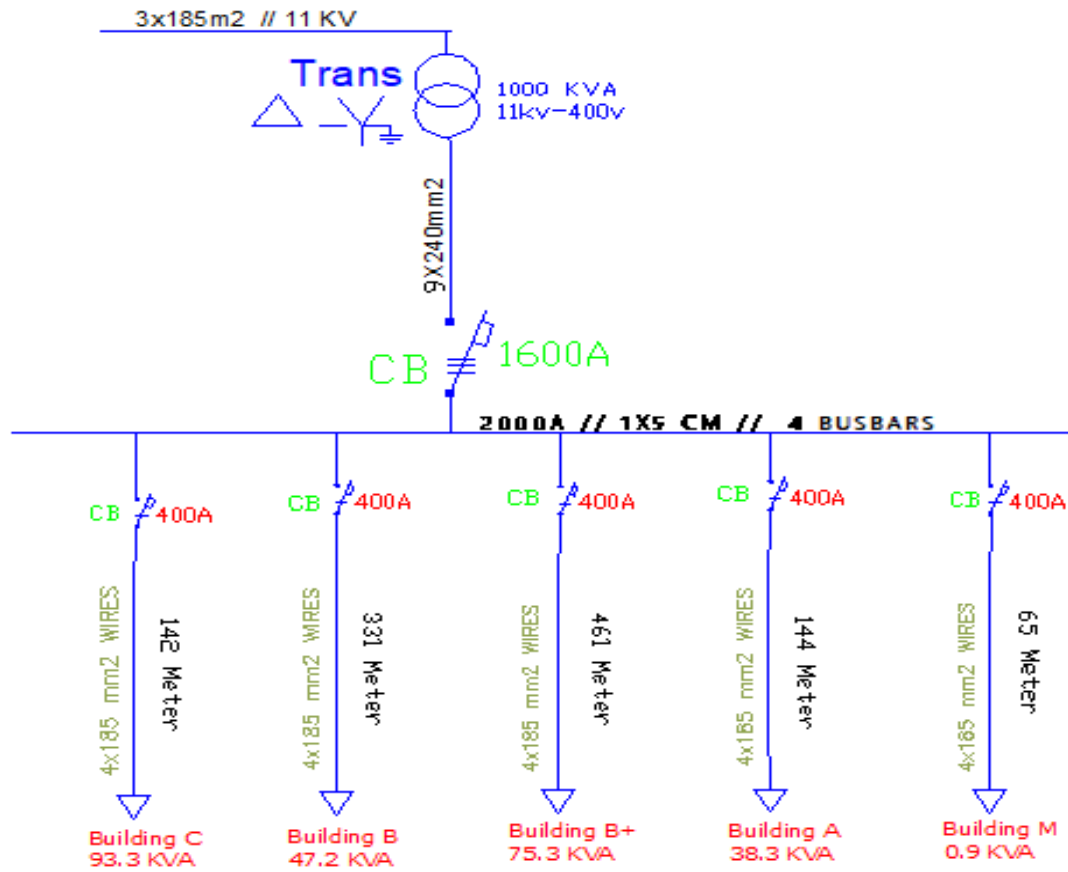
AutoCAD drawing for electrical single line diagram of the Palestine polytechnic university.
